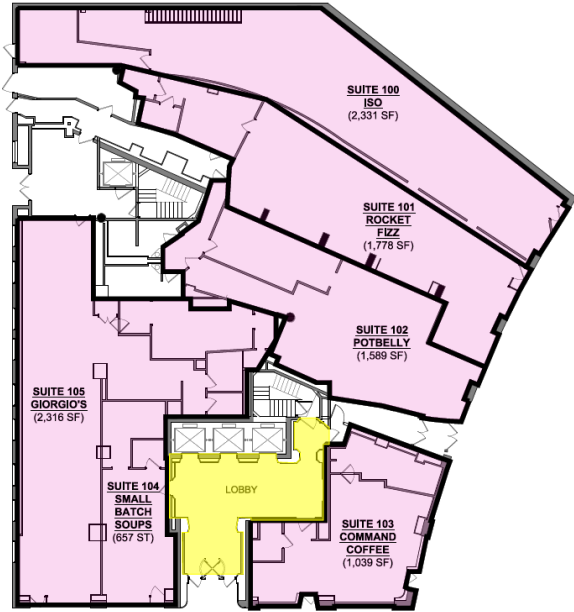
Floor Plan; Lobby Highlighted in Yellow
